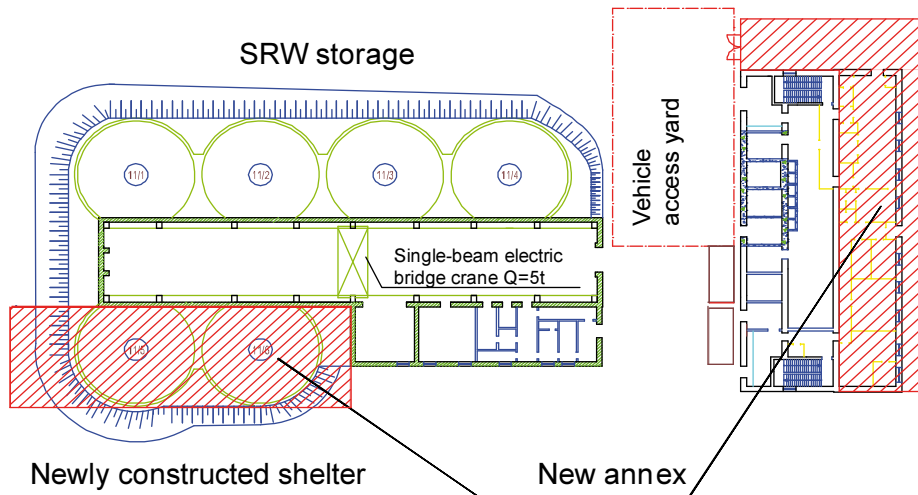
Layout of buildings and shelters for LRW treatment equipment
